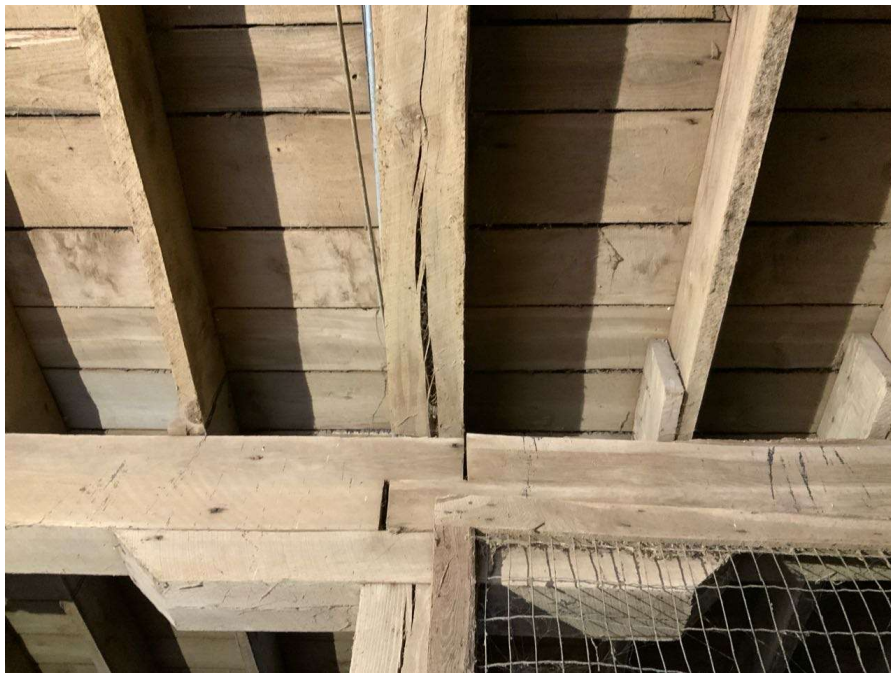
Wide check on the bottom face of the north/south spanning hayloft floor beam. Beam between Columns D/2.5 and D/3 shown looking north.
